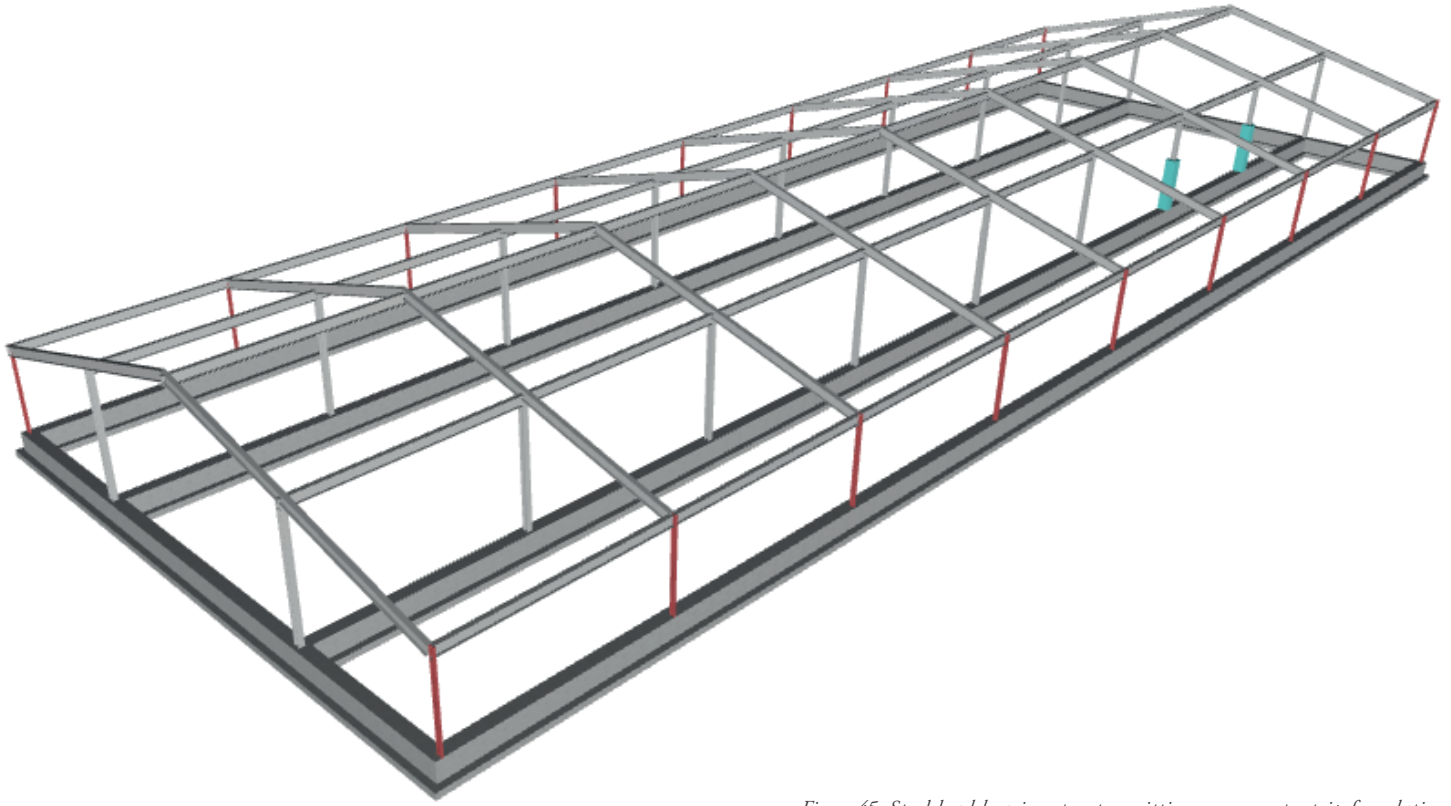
Steel load bearing structure sitting on concrete strip foundation
